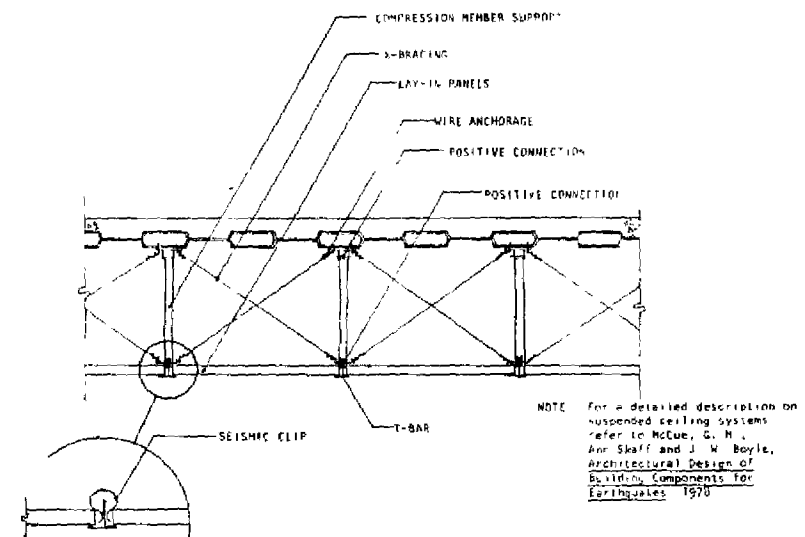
Suspended ceiling systems. T-bar and acoustic lay-in ceiling suspension system.
